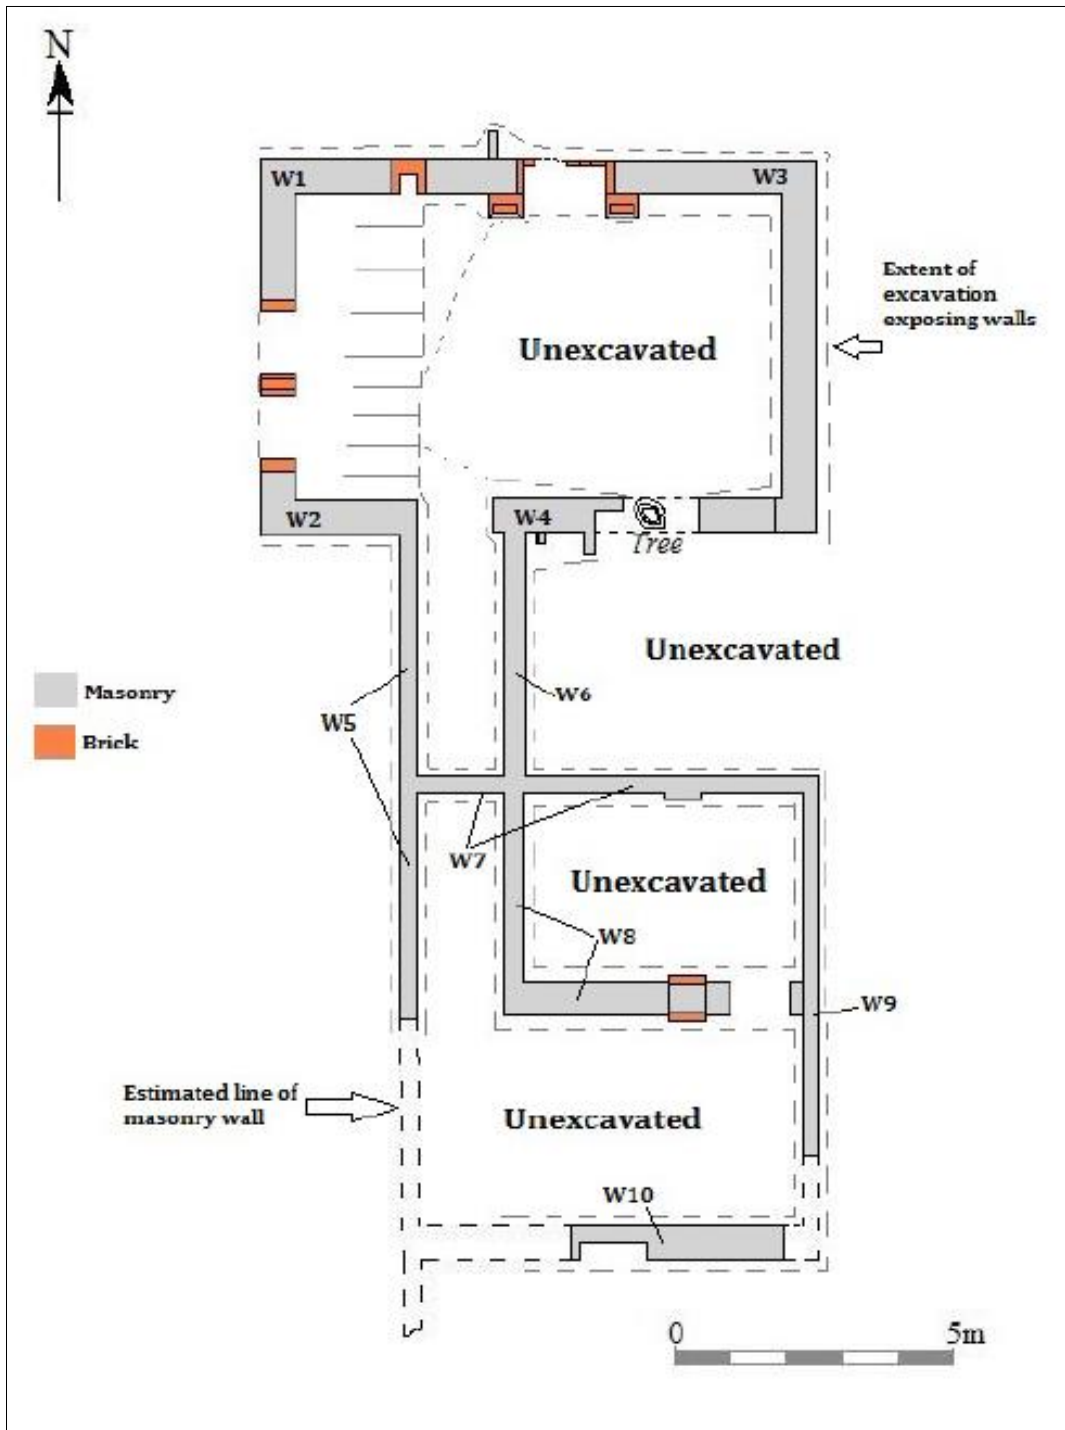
Overall site plan of 'Richardson's House' foundation walls
